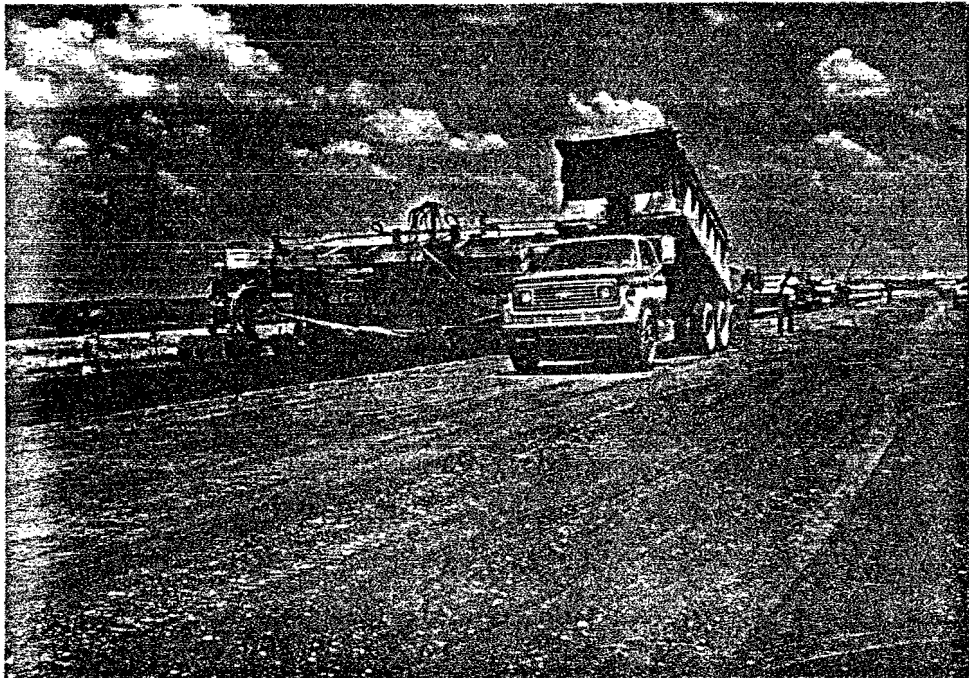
Side Loading Concrete Spreader on IH 27, Hale Co., (Test Site 9).
